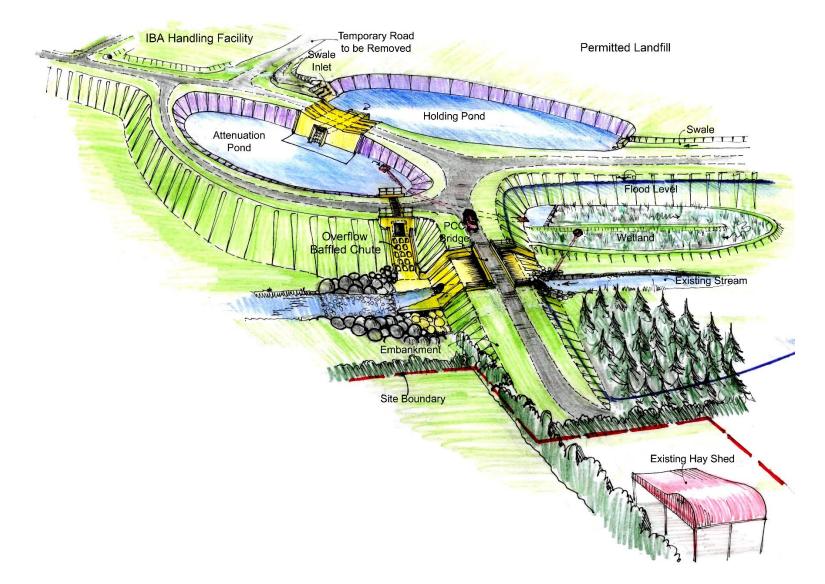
Artist Impression Northern Stormwater Attenuation Pond and New Flood Area
